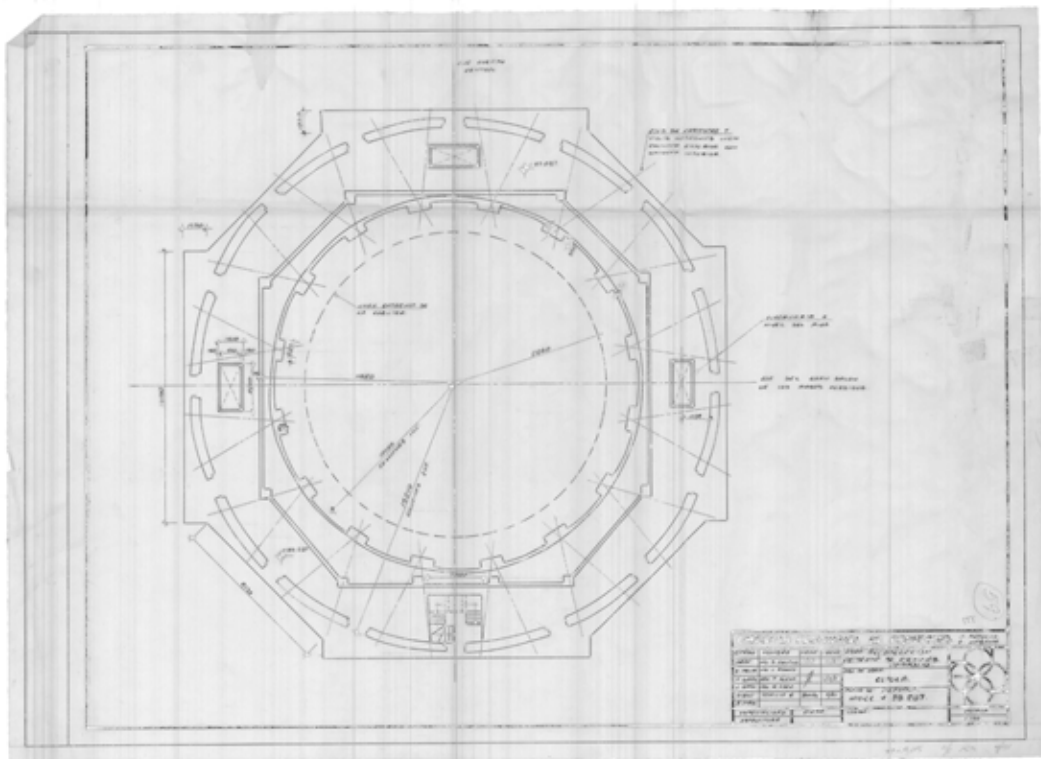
Groundfloor at level +33,28m. Source: Hand-drawn plans of the Capitol building.
